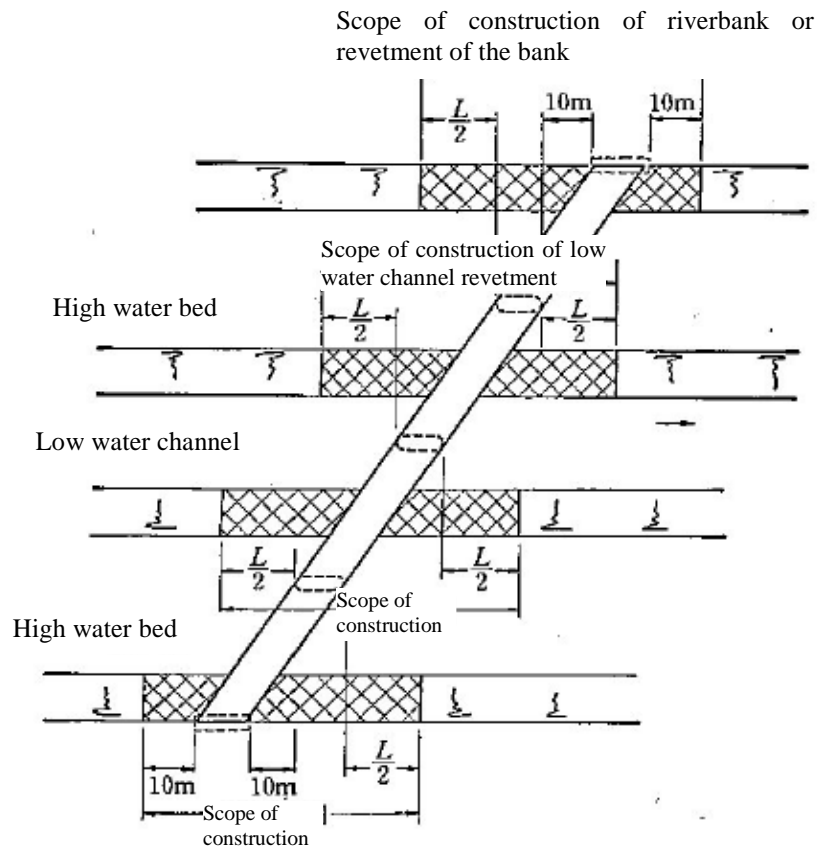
Length of revetment necessary for the establishment of a bridge
